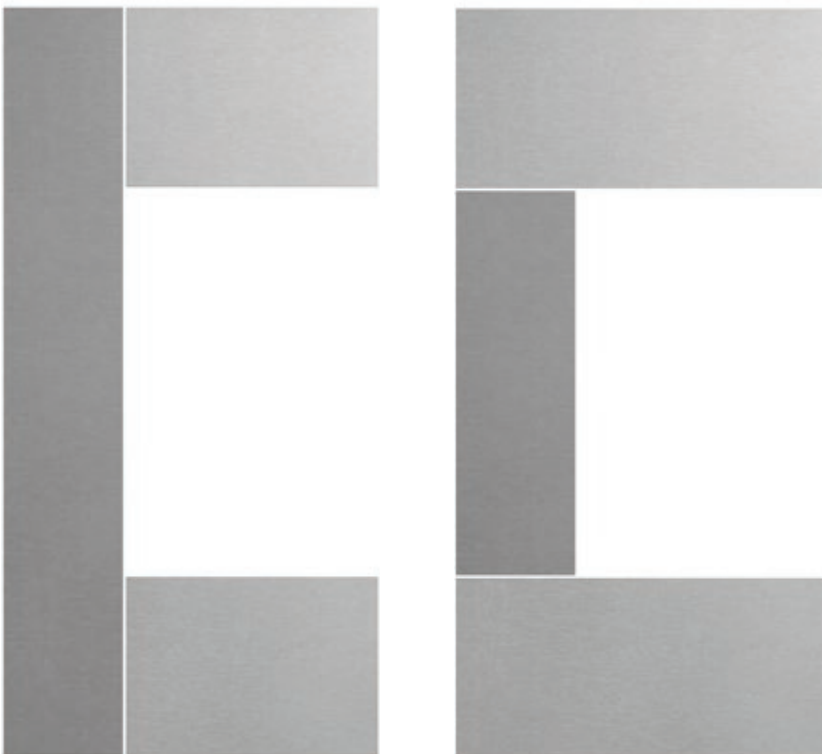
Correct installation of Swisspearl facade boards at windows, doors and openings.
